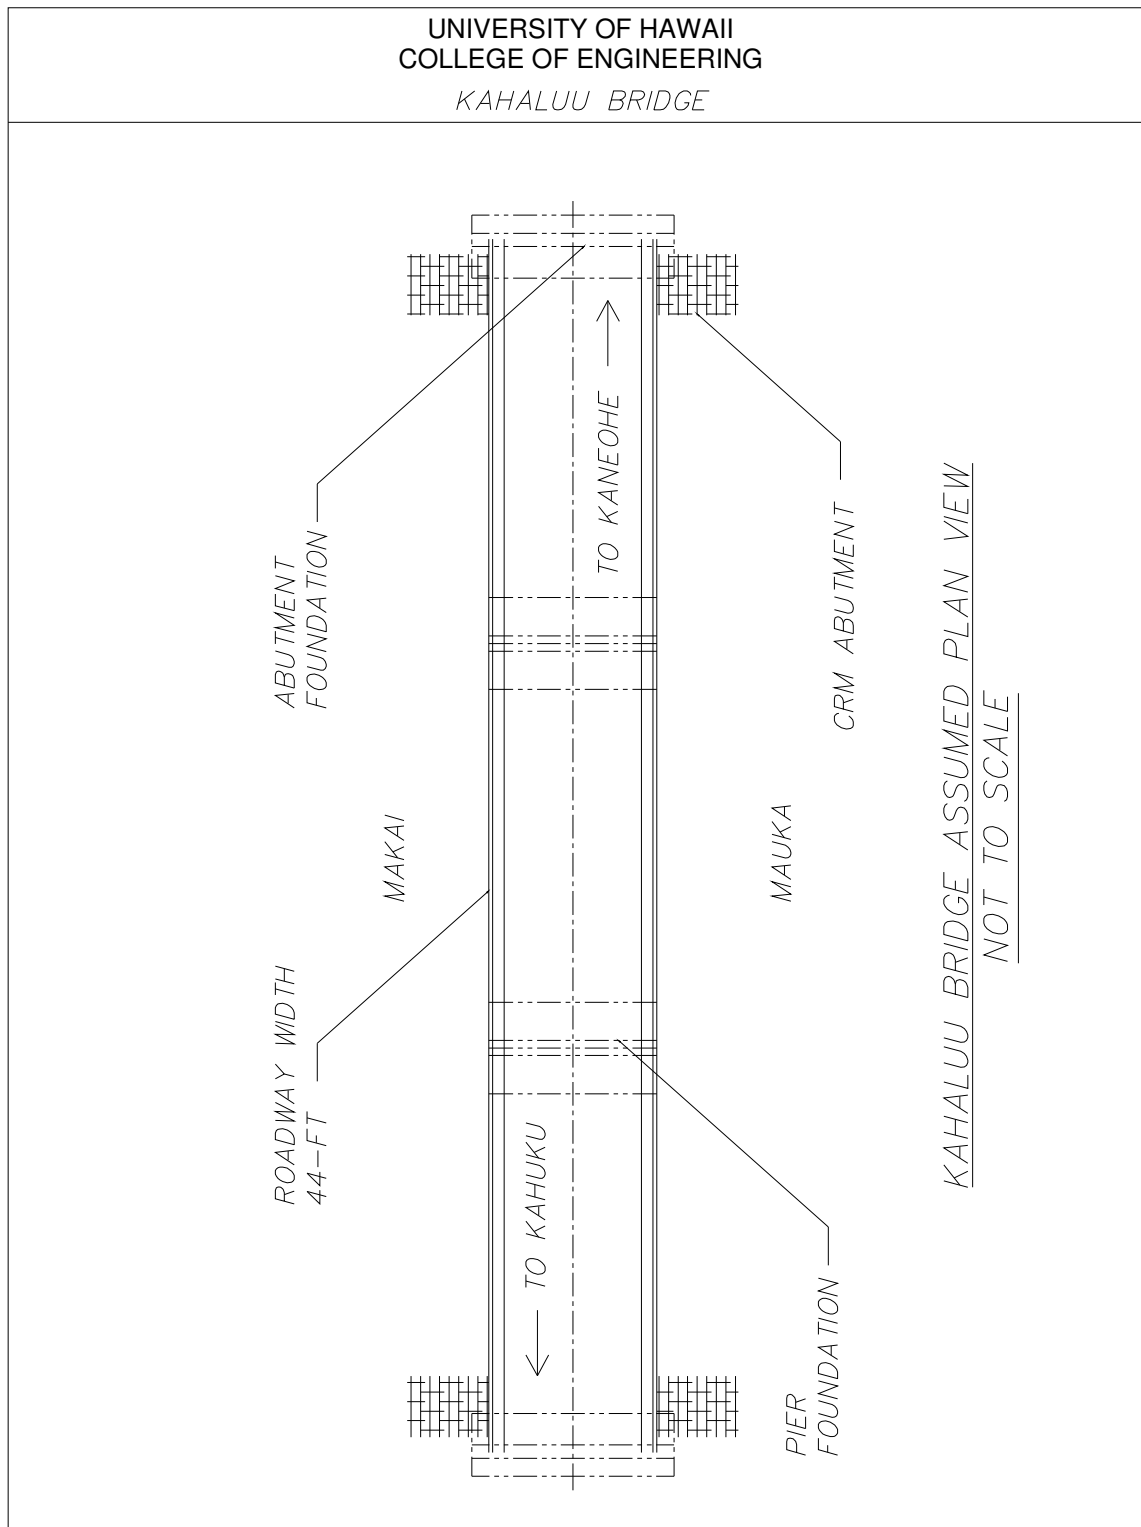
Plan view of Kahaluu Bridge used in HEC-RAS analysis
